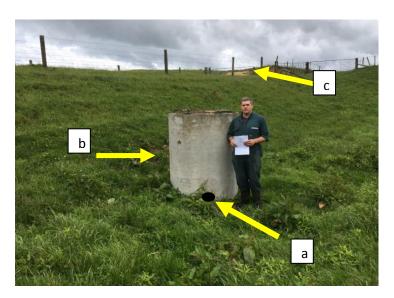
Concrete pipe riser showing restricted drain hole at base (a), skimming riser with large cultert (b) and emergency spillway (c).
